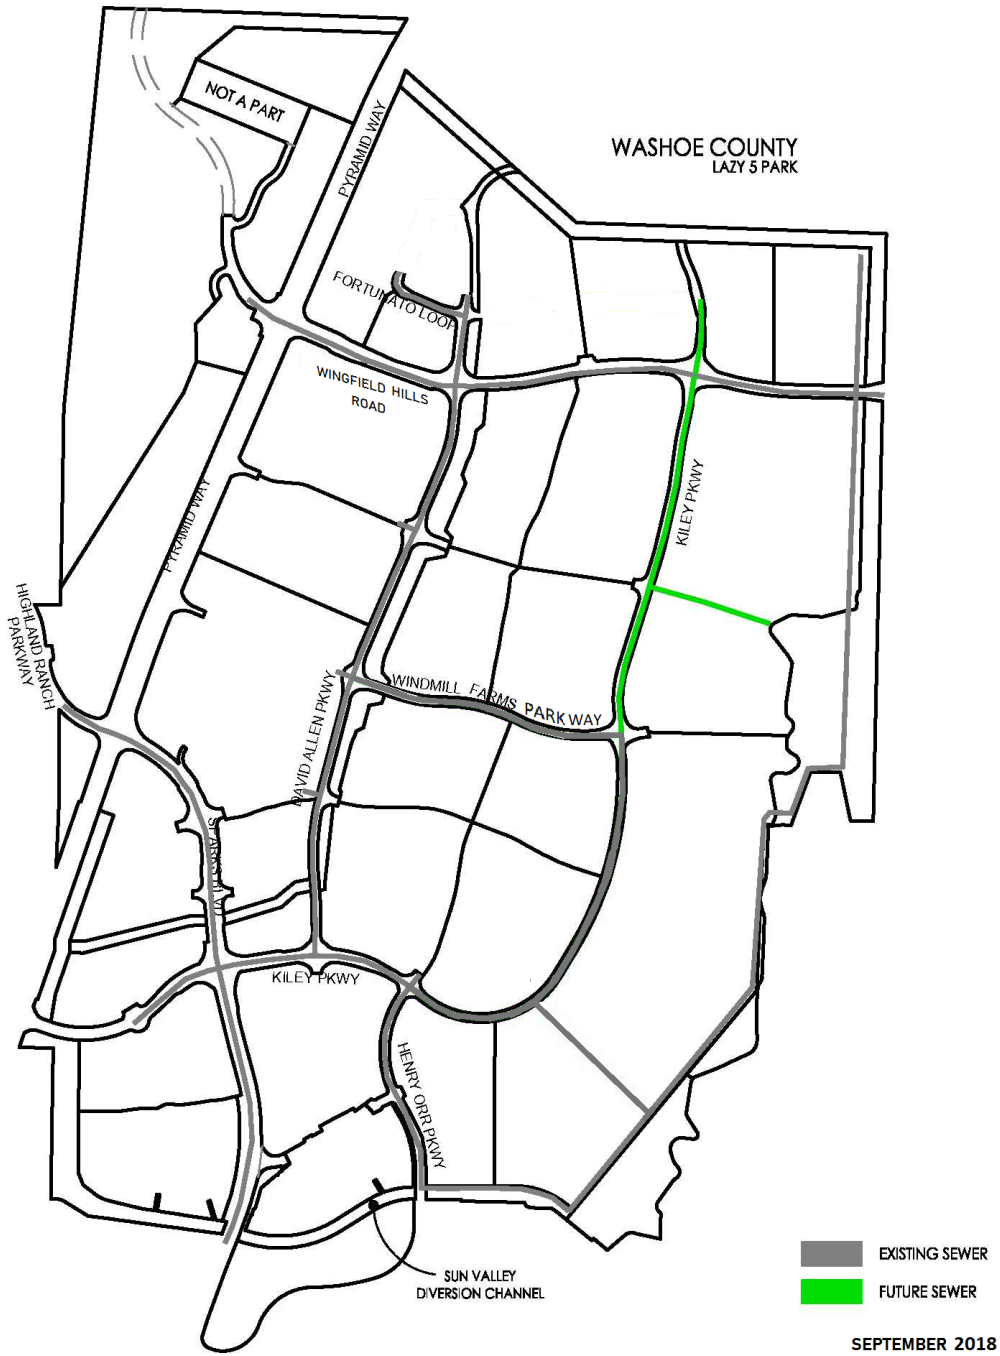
Existing and Proposed Sanitary Sewer Facilities
